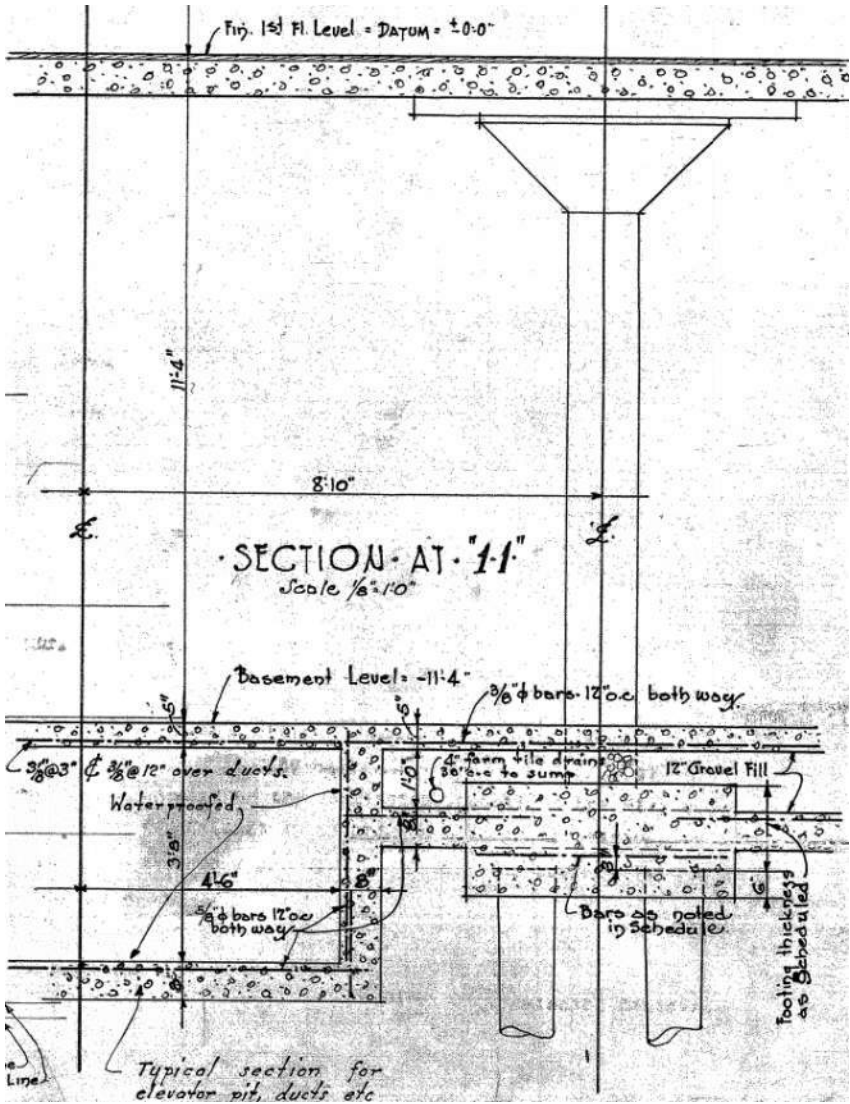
CROSS SECTION SHOWING DOUBLE BASEMENT SLAB, DRAINAGE LAYER AND TWO-WAY FLOOR SLAB ABOVE
